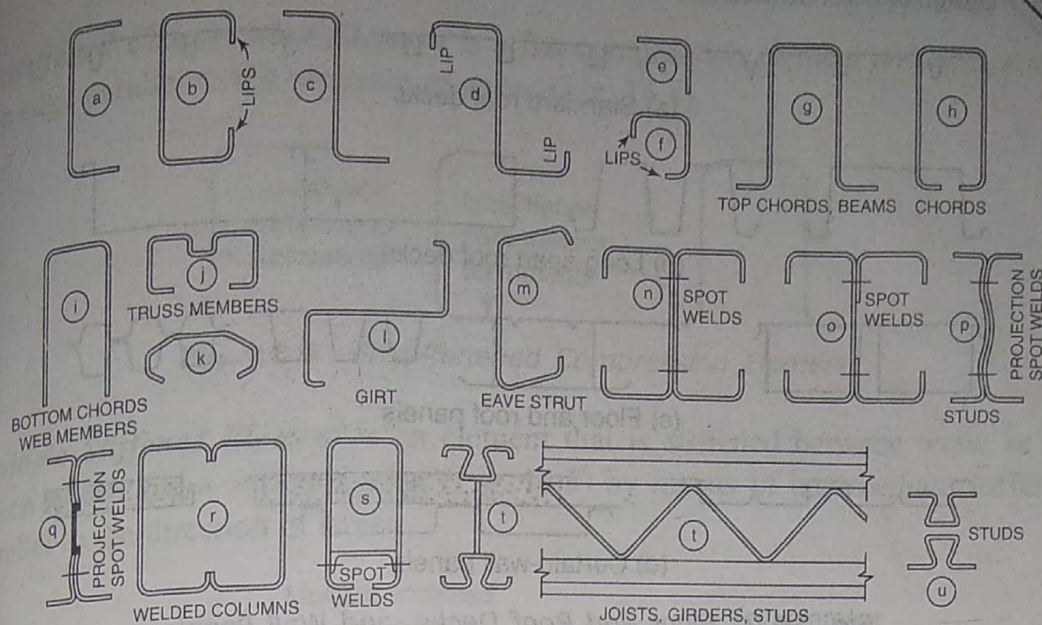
Common Shapes of Cold-Formed Light-Gauge Sections
